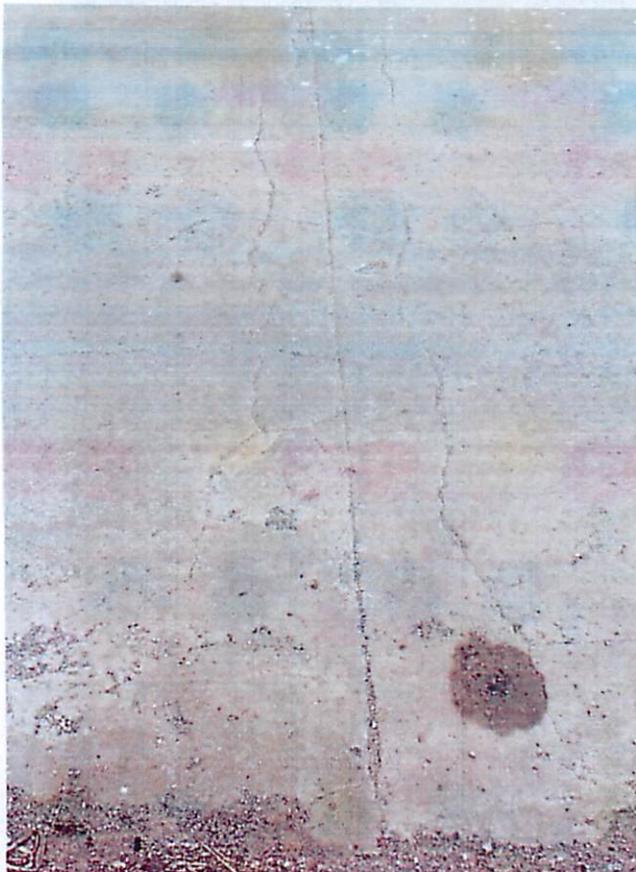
(side photo) cracks in deck. Typical over each pier.
